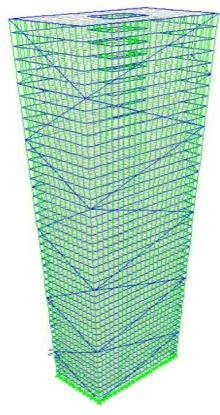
Steel Tubular Structure with Mega Bracing System Model M3
